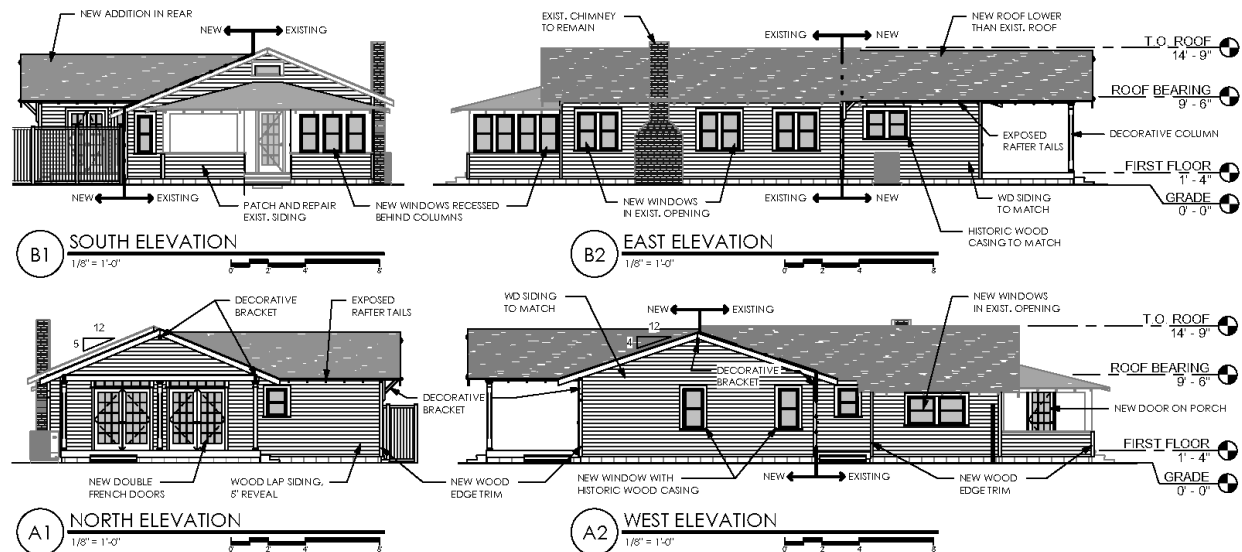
Proposed elevations of rehabilitated structure with rear addition.
